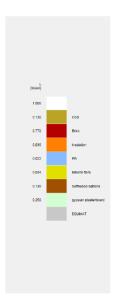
E16 (drawing 10-AC-03) filled cavity – materials legend
